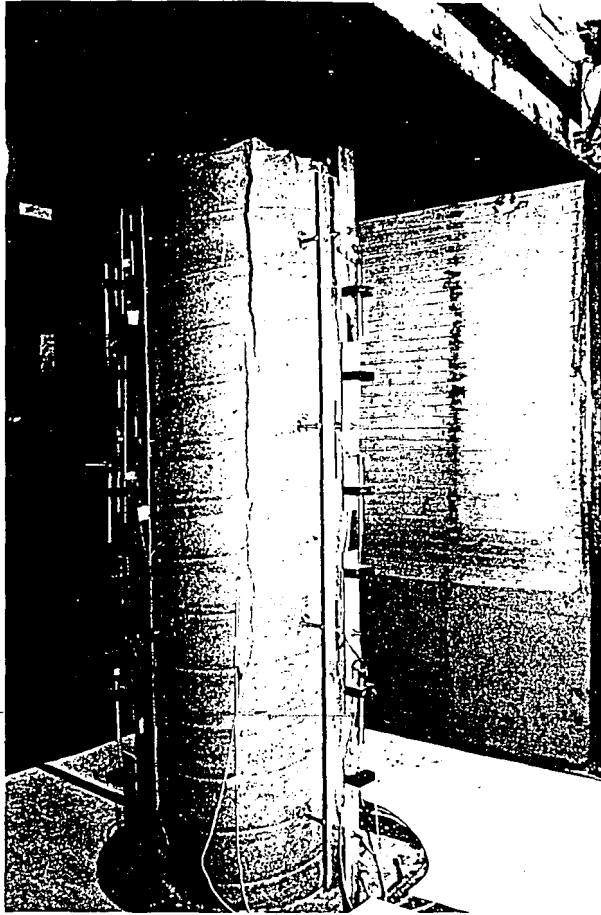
(a) Specimen M2-series of key photographs; (a) longitudinal splitting crack on southeast face.
